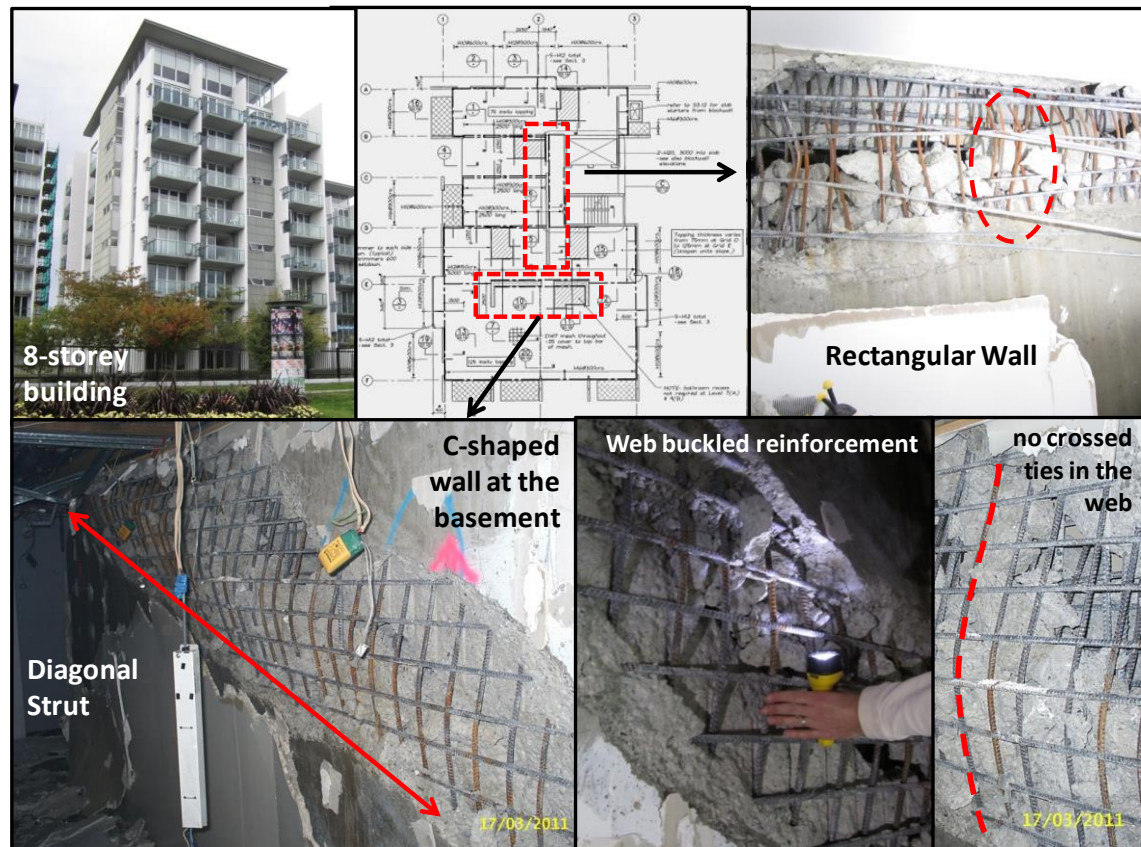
Building C (8 storeys): Central RC walls damaged.
